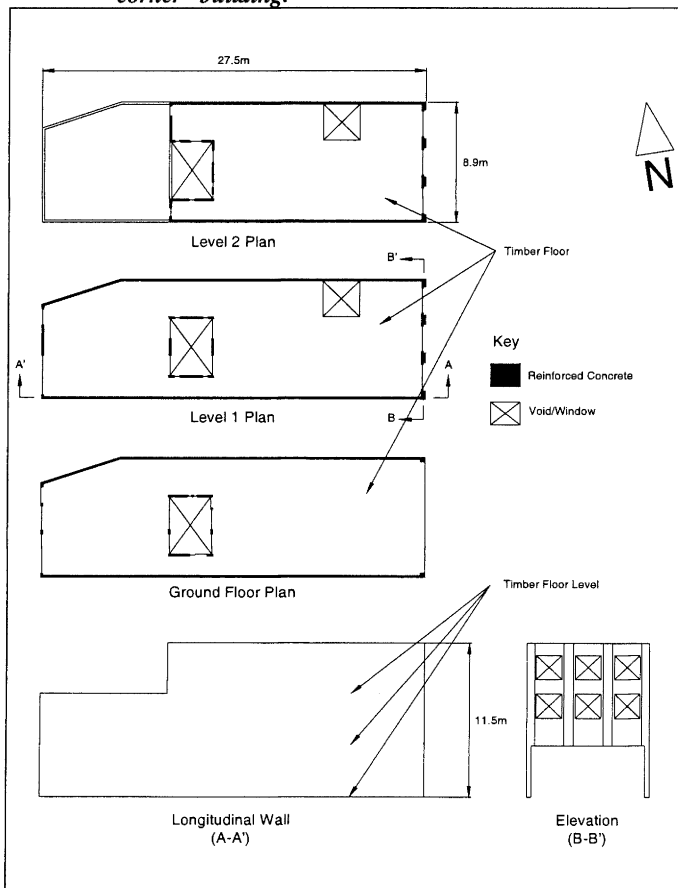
Plans and elevation of the Bennett Building, Napier, showing soft-storey construction.
